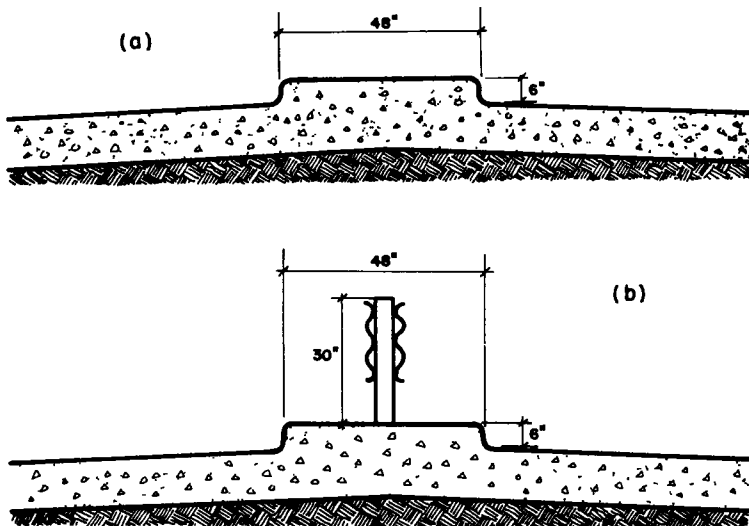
Median sections, Gulf Freeway, Houston: (a) section before construction of barrier fence, and (b) section after construction of barrier fence.
